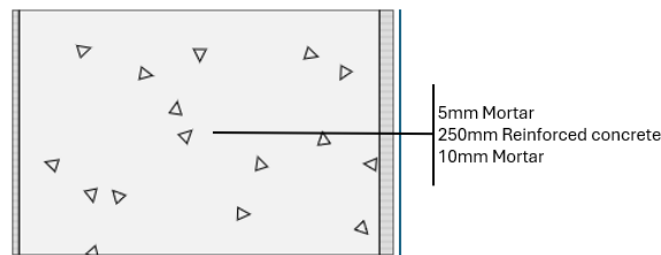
Existing exterior concrete wall at Byalagsgatan 8 (Laven and Strandberg, 2019, Cecilia Björk, 2021)
